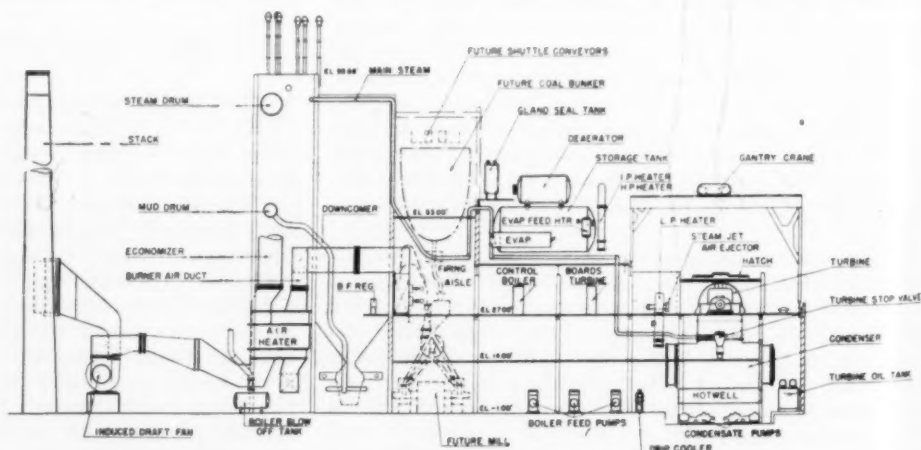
SCHEMATIC CROSS SECTION OF 1947 INSTALLATION INDICATING THE MAJOR EQUIPMENT AND THE PROPOSED FUTURE COAL-FIRING EQUIPMENT
